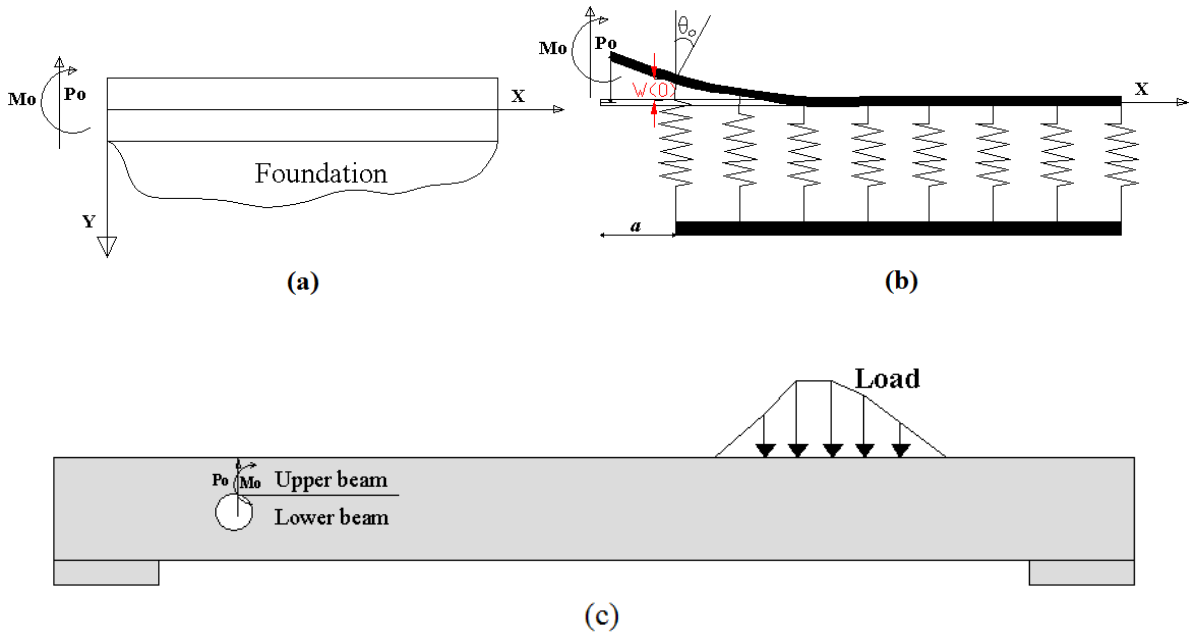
Model of beams on elastic foundation: (a) beam on foundation, (b) schematization of a beam on spring as elastic foundation, (c) crack around a round hole
